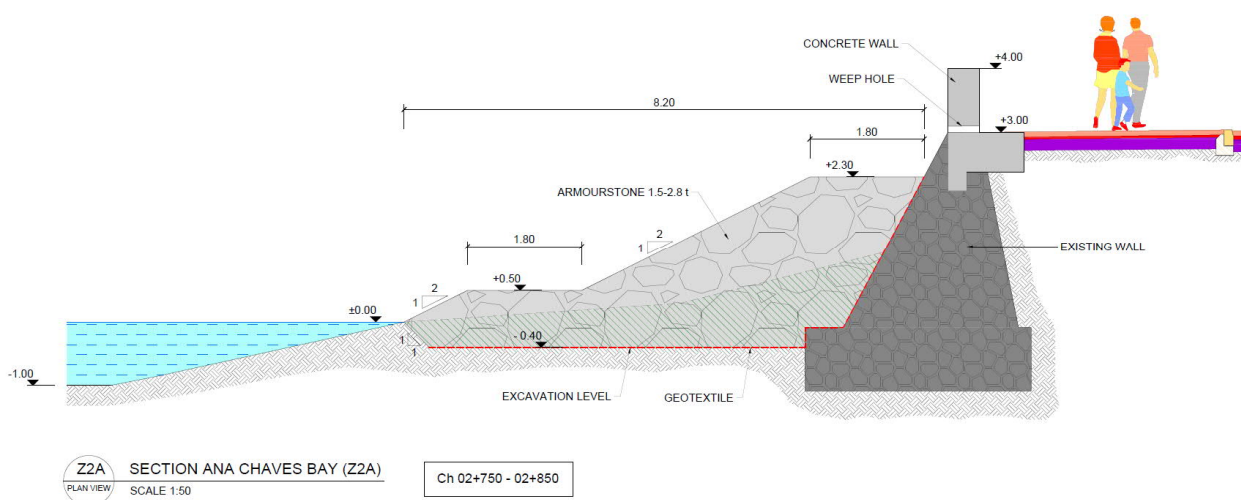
Typical cross section Ana Chaves Bay (2+750 – 2+850)
